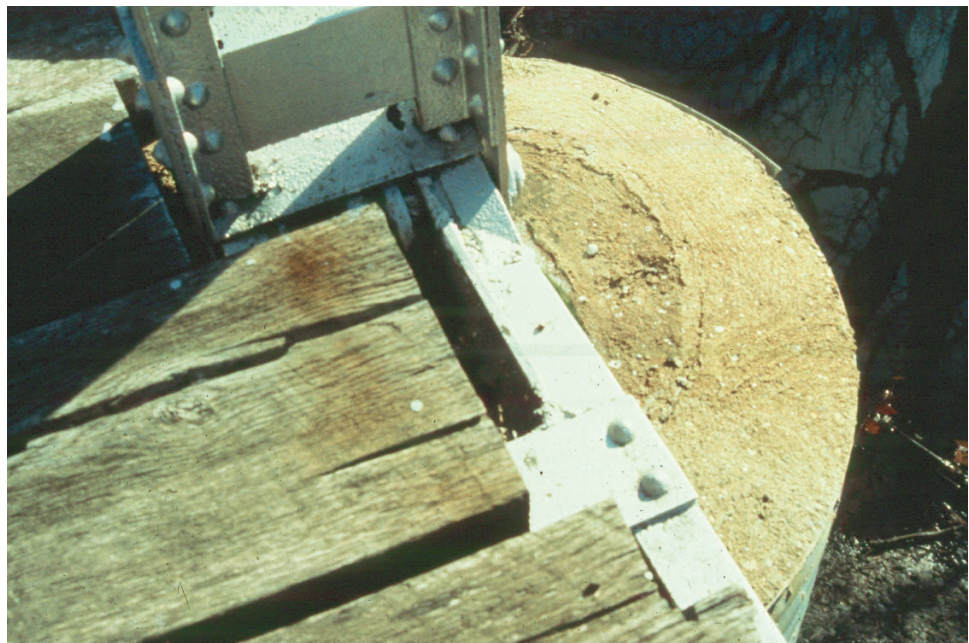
Bearing and Shear Area on a Timber Deck
